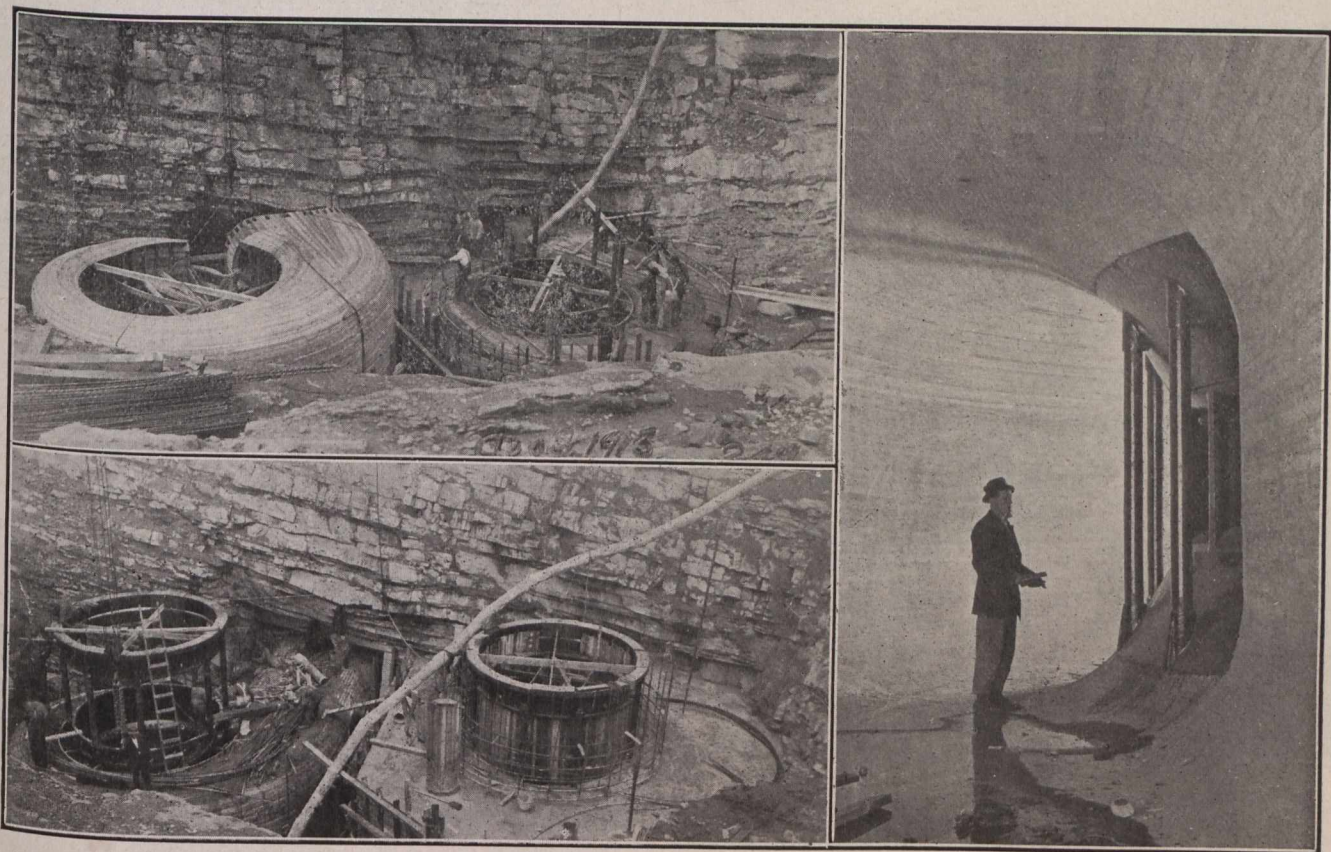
Scroll Chambers During Construction. Also Interior View of One with Forms Removed, Showing Turbine Frame in Place.
